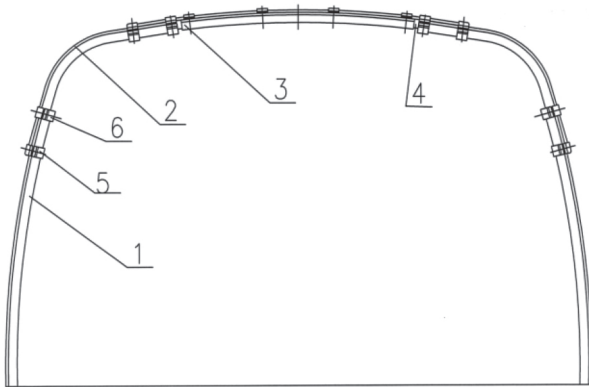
ŁPrw frame: 1 – side section, 2 – upper side section, 3 – top section, 4 – reinforcing top section, 5, 6 – shackles
